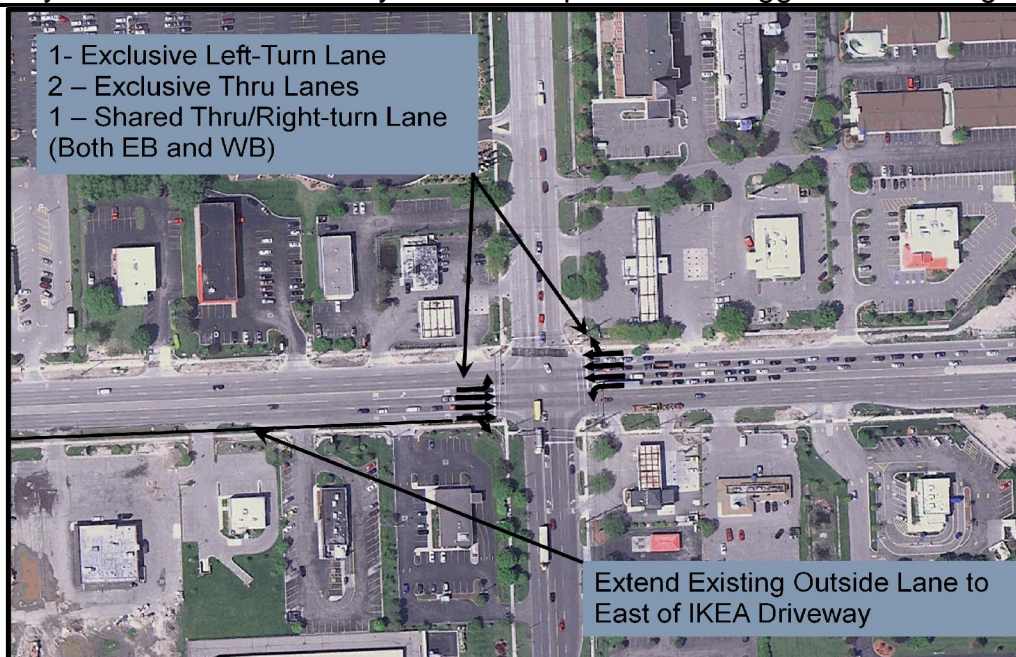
Potential 3-Lane Section on M-153 at Haggerty Road
